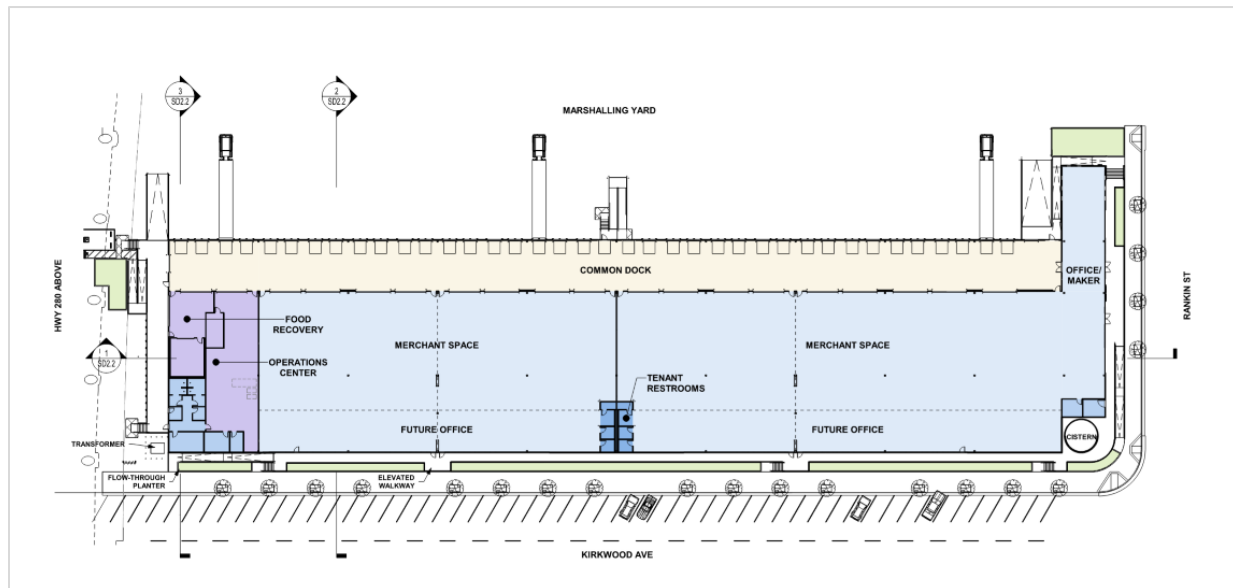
shows the street and marshalling yard planned improvements, and Exhibit 2 shows the proposed design for 1900 Kirkwood Avenue.
